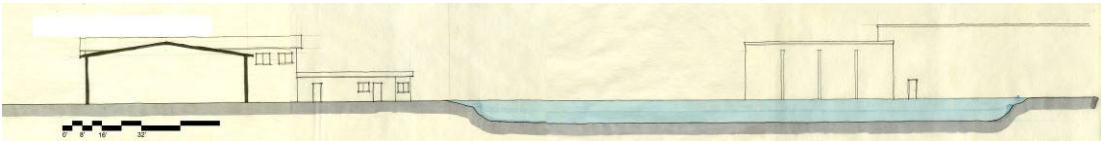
Existing site section through inlet showing existing buildings on the site.
